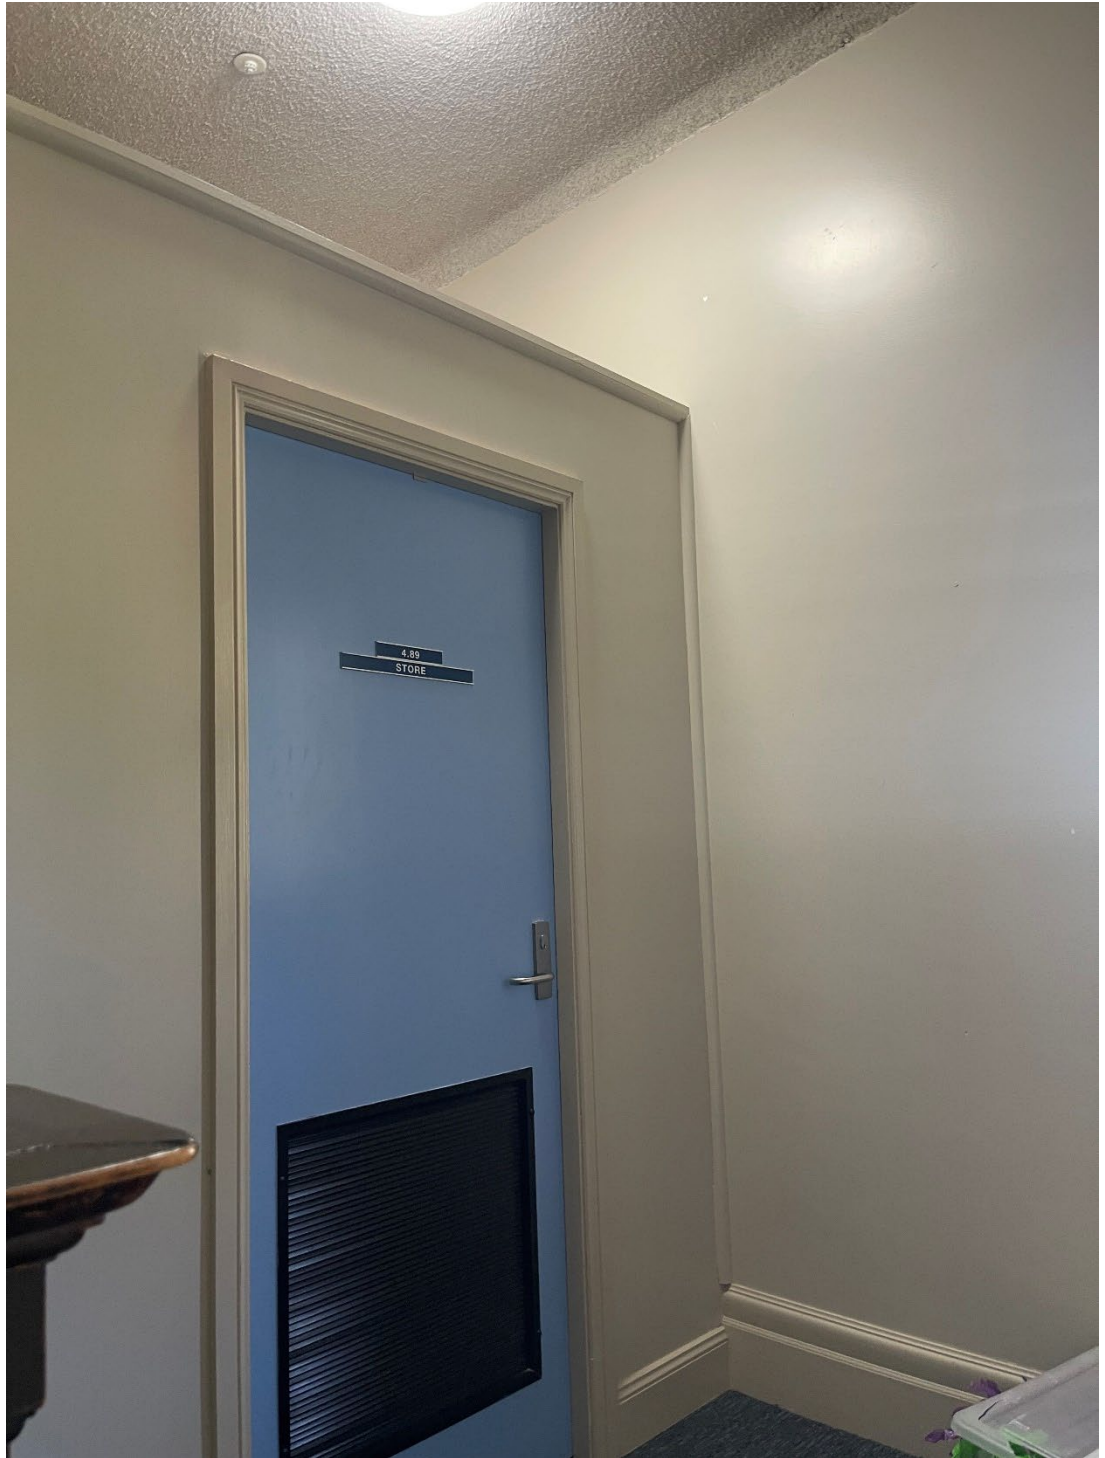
Partition wall, later door and spray ceiling finish on Level 5 are not significant. The partition wall is to be removed.
